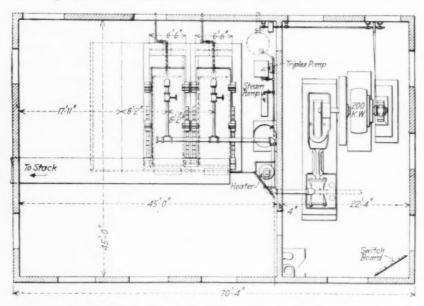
Plan View of Power Plant for the Bristol Manufacturing Company
